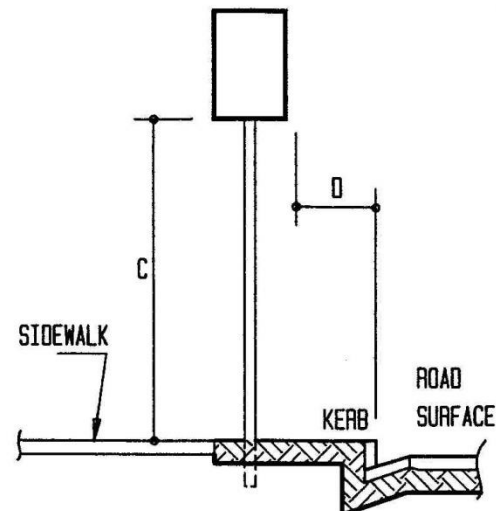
Typical Installation—Minimum Size W401/W402
